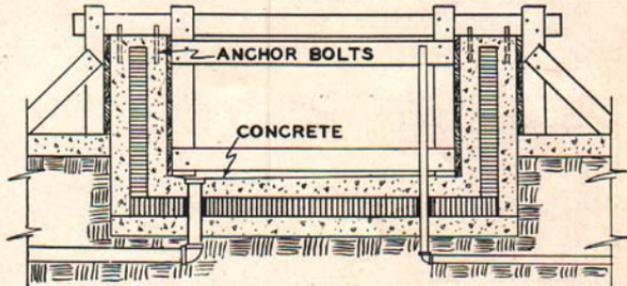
Step No. 5. Concrete is first placed on the floor to the height of the side forms, then the wall space is filled on either side of the insulation. Anchor bolts should be placed in the top of the concrete wall for attaching the plate. The nuts of the bolts should be countersunk below the top of the plate.
